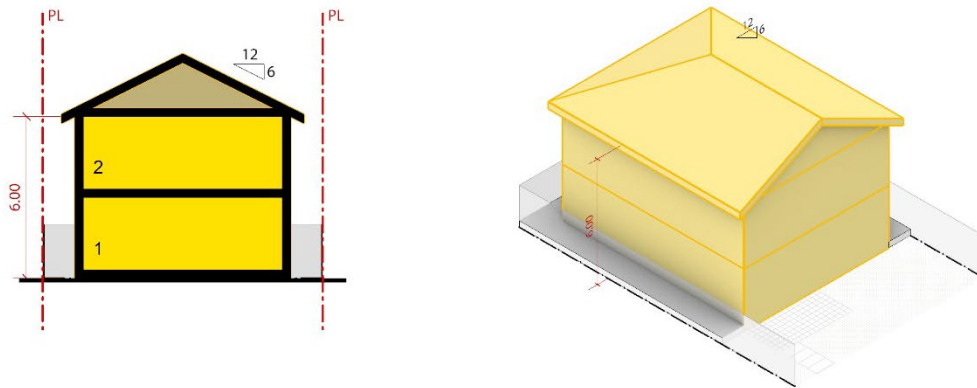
Accessory residential building with a maximum main wall height of 6.0 metres and a pitched roof.
